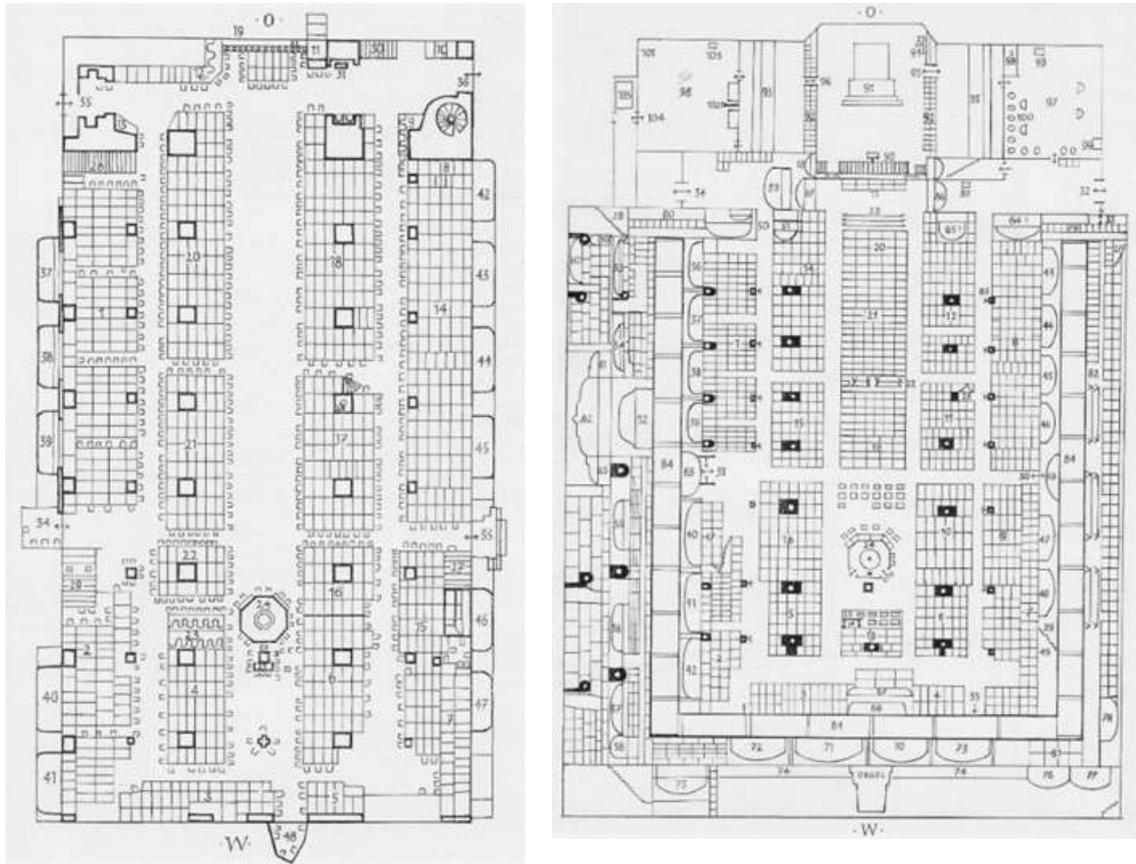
/b. Floor plans. Drawings by Lotte Schumann after old floor plans.
